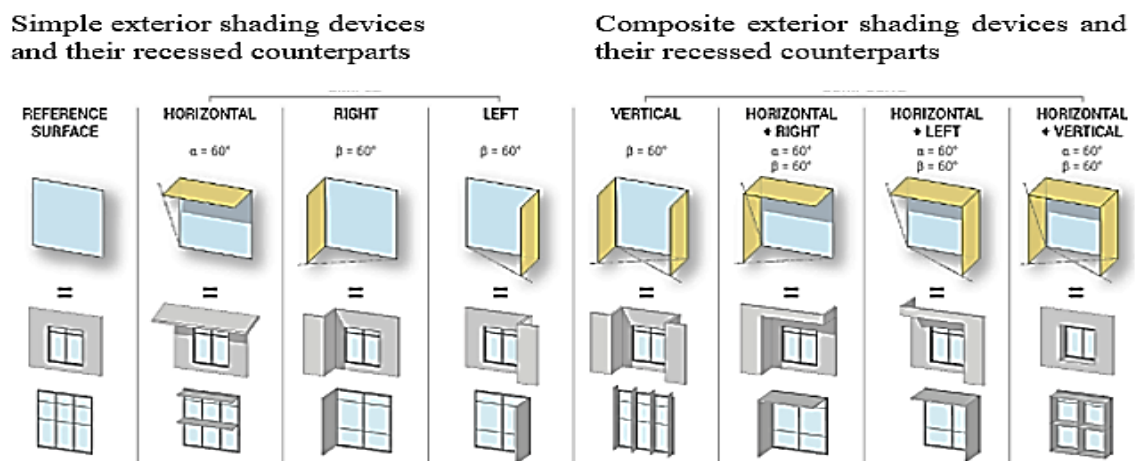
Exterior Shading Devices and their Alternative Recessed Wall Facades
